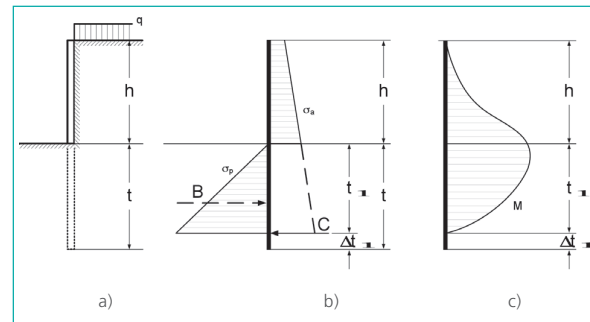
Retaining structure with double lateral support: (a) final excavation, (b) forces and active and passive lateral pressures and (c) bending moments diagram (EAB 2008)
